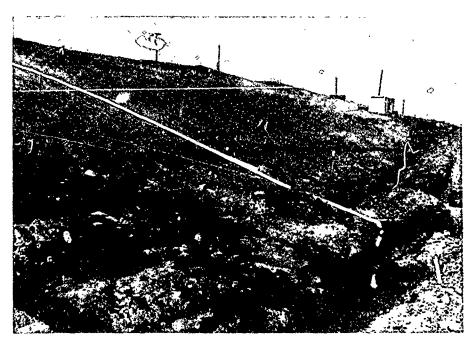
Outlet Works excavation showing peripheral ditches controlling ground water.
